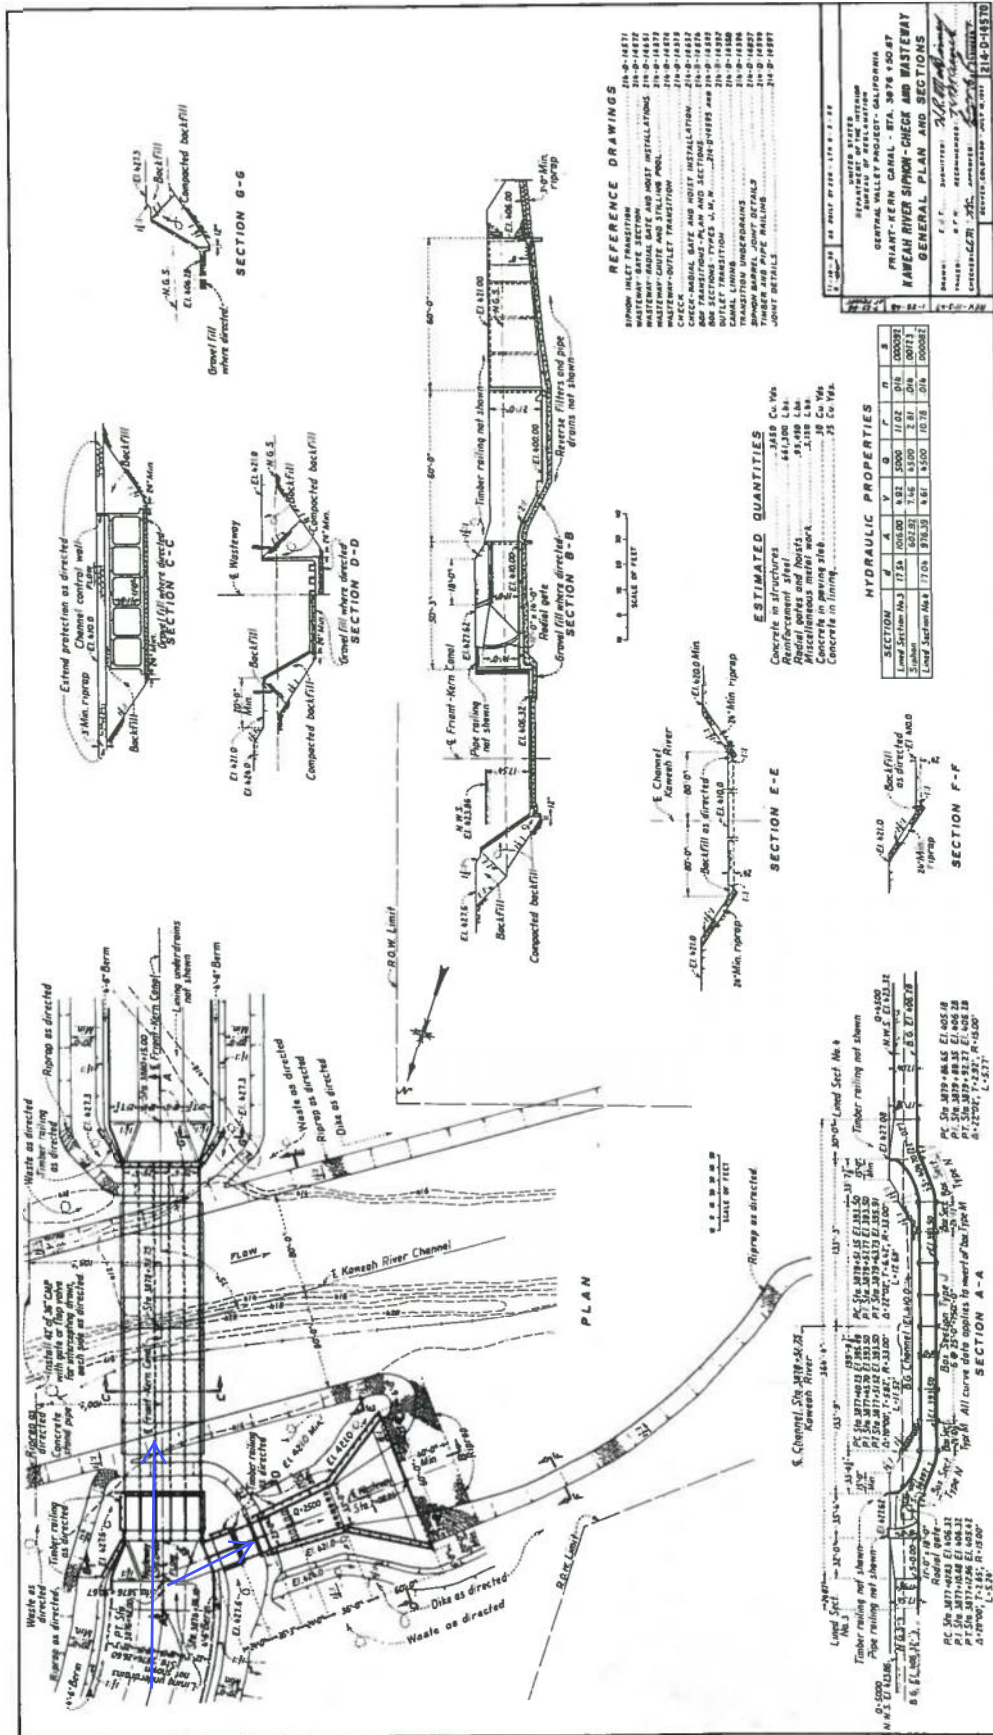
Kaweah River siphon --Check and wasteway --General plan and sections.
